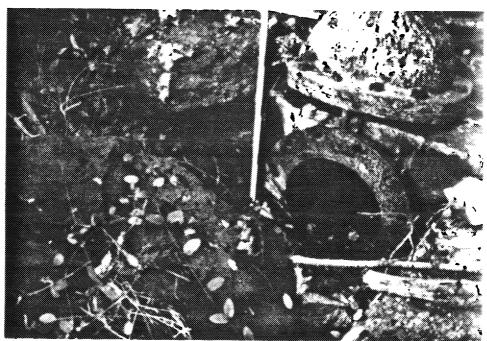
12 " outlet valve below downstream weir. Note scepage to left of value opening.
